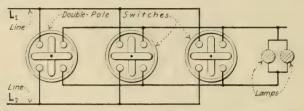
Method of connecting three or more double-pole switches in parallel. (Lamps may be lighted by closing any switch. All switches must be open to extinguish lights.)
